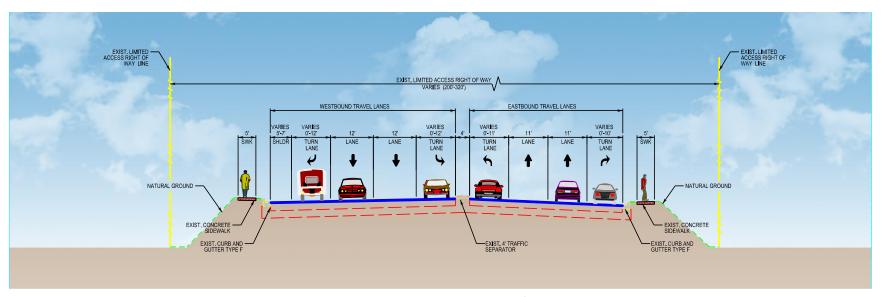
Typical Section - Lantana Road from SR 9/I-95 to Shopping Center Drive
